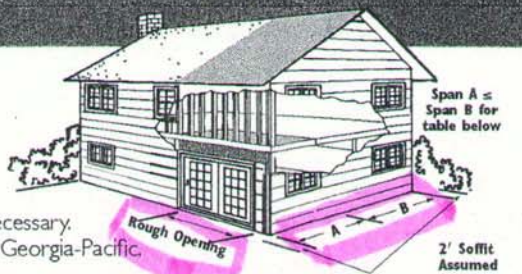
LVL BEAM ABOVE PATIO DOOR
